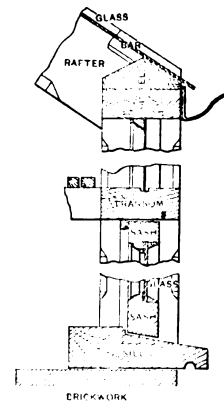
Details of Frame Work.—Scale, 1 1/4 Inches to the Foot.
